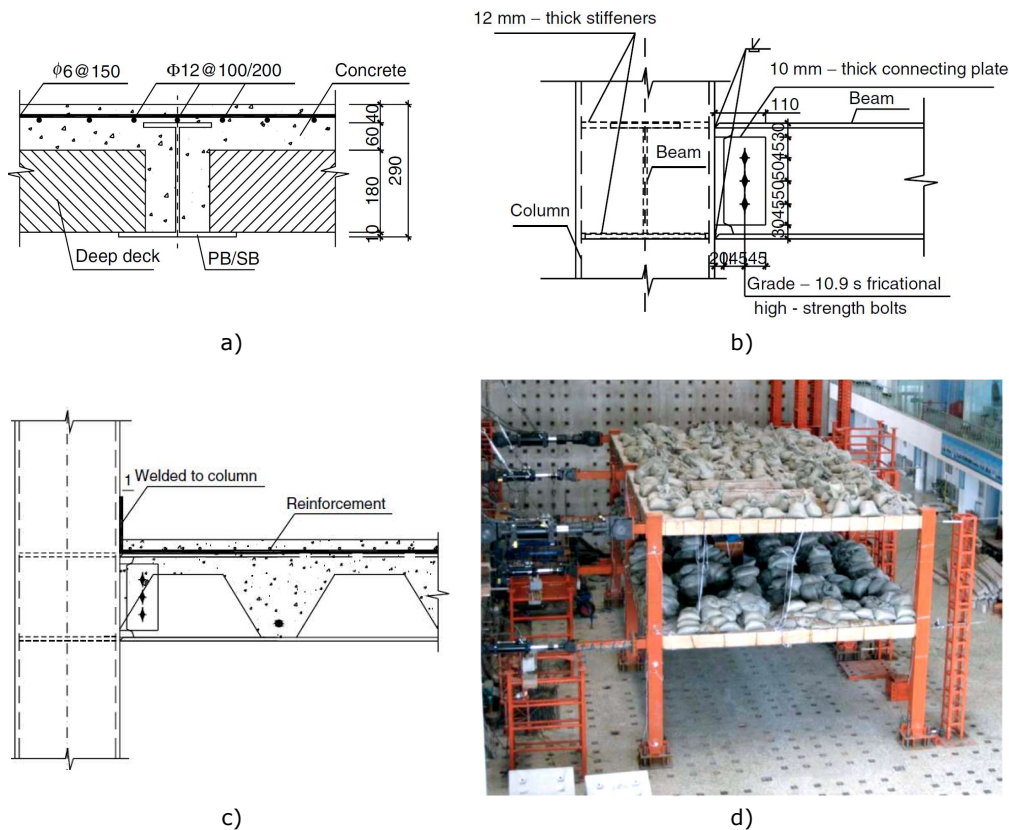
Images from Yang et al. [41]: a) cross section of slim-floor beam; b) welded beam-to-column connection; c) anchorage of longitudinal reinforcement; d) test setup
